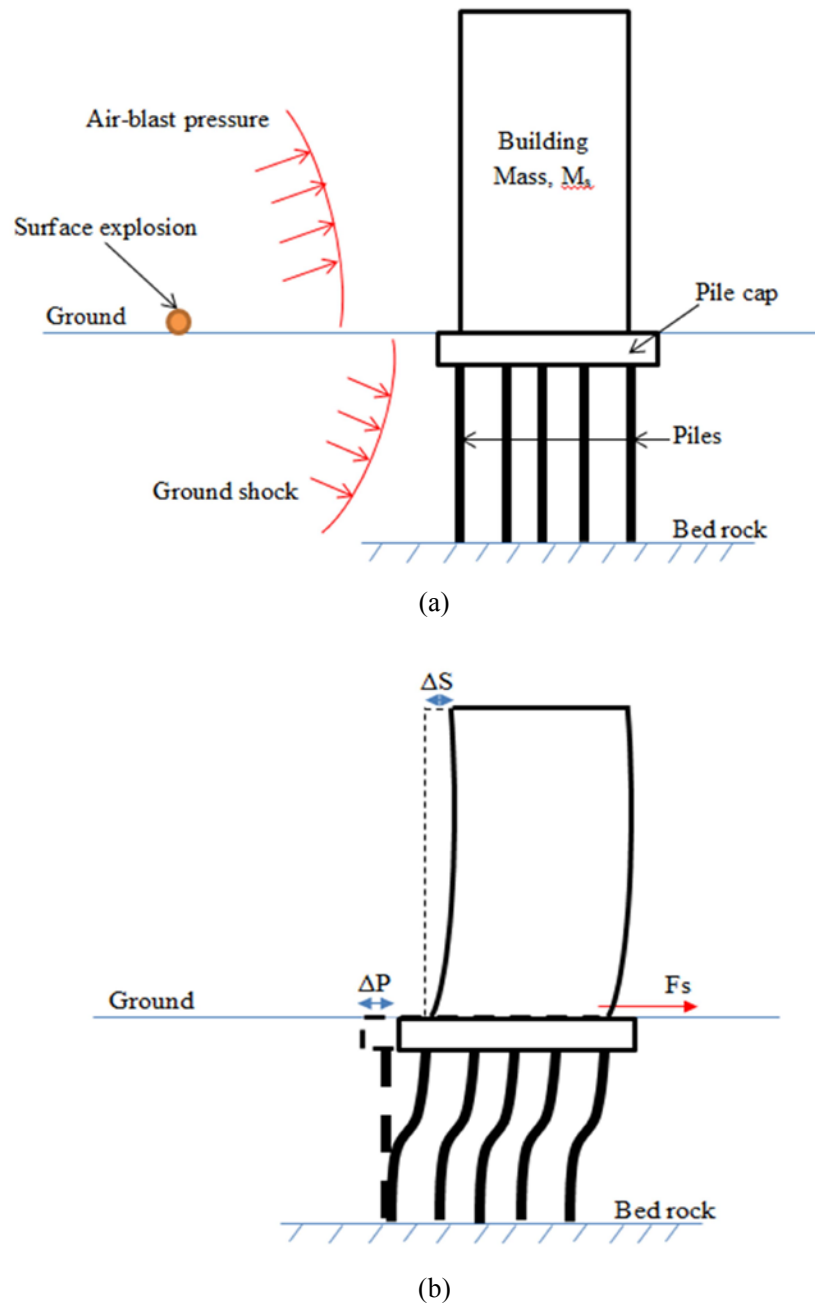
(a) Blast pressures on superstructure and its pile (b) Response of structure and foundation
